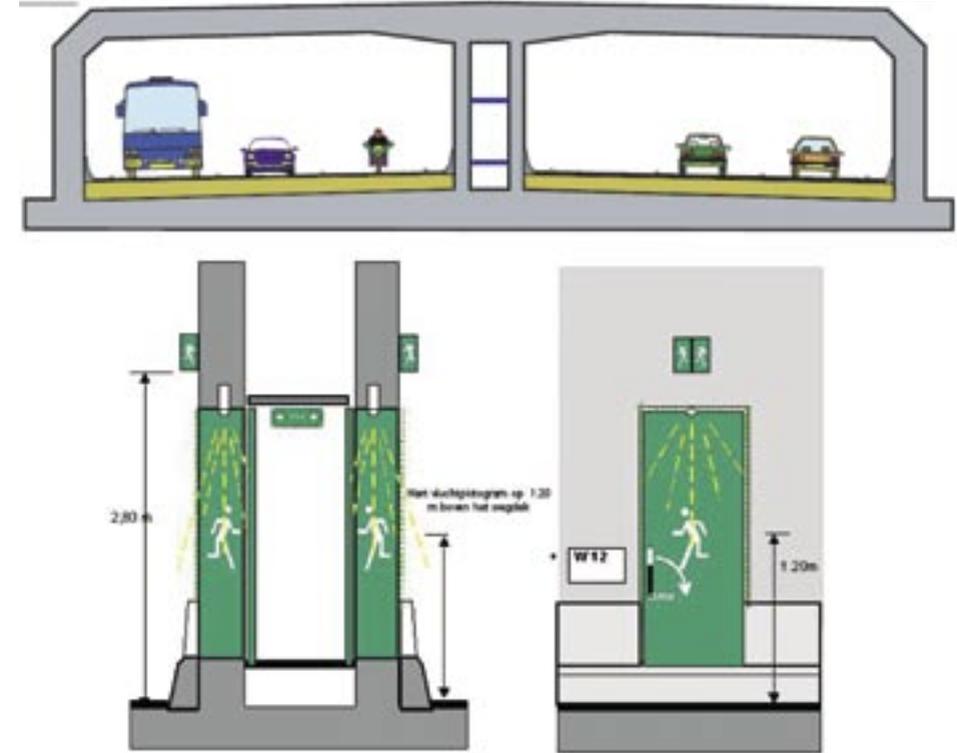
Typical cross section of immersed tunnel with parallel escape gallery between the tunnel tubes and design of emergency exit according to Dutch guidelines
